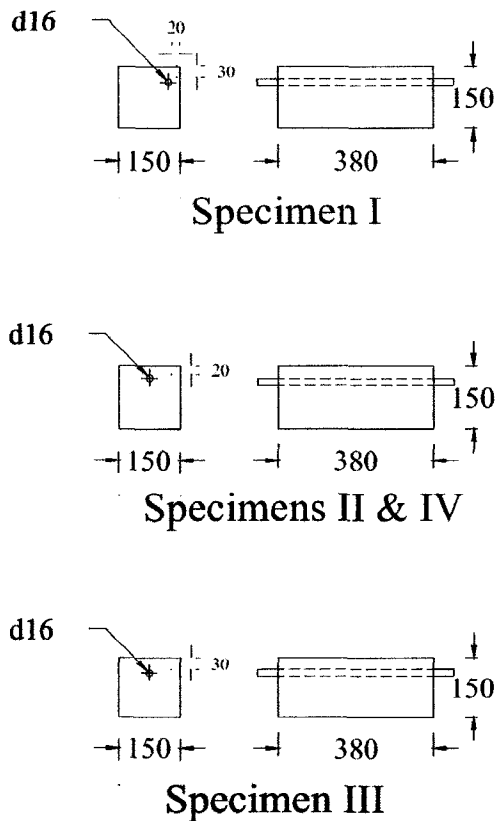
Dimension and steel rebar locations of specimens of Andrade et al. (1993)
